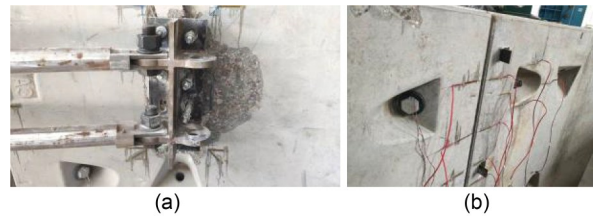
Concrete crushing on the external side of the segmental joints: (a) Specimen 1; (b) Specimen 2
